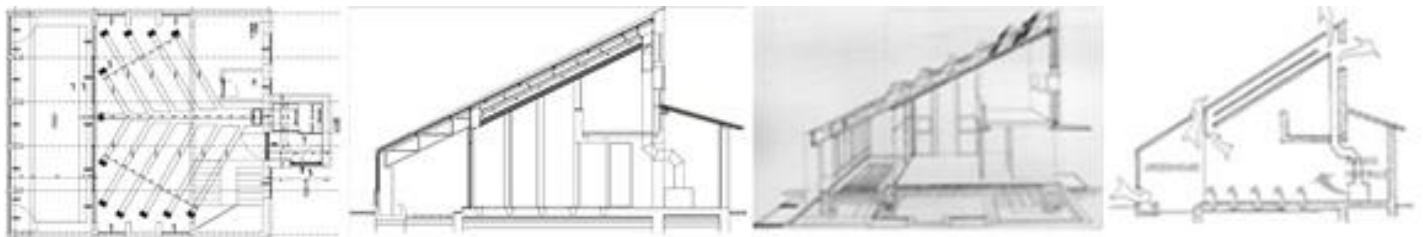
METU Solar House Piping Plan and Section (Ecevit and Demirbilek, 1994; Demirbilek et al, 1997a)
